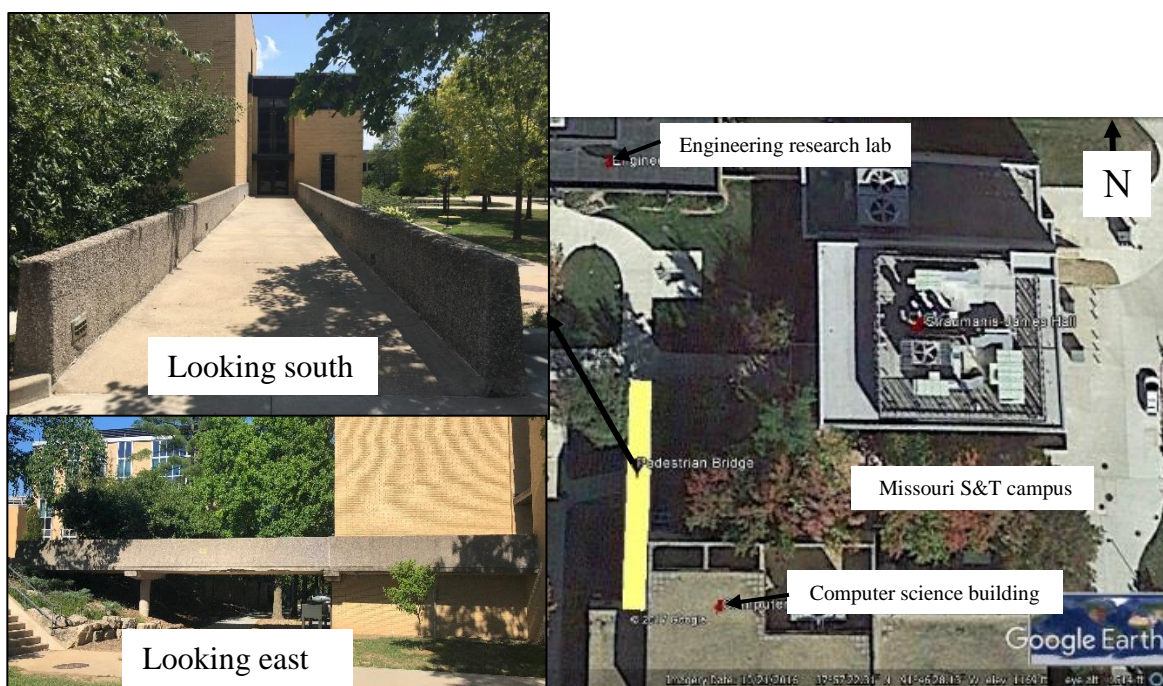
Bridge deck (courtesy to Google Earth Pro).
